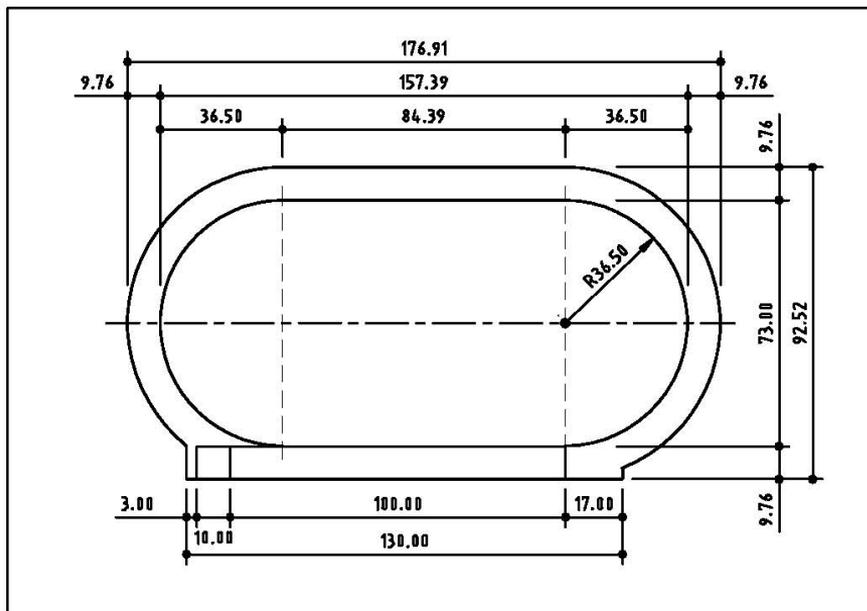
Shape and dimensions of the 400m Standard Track (Radius 36.50m)
